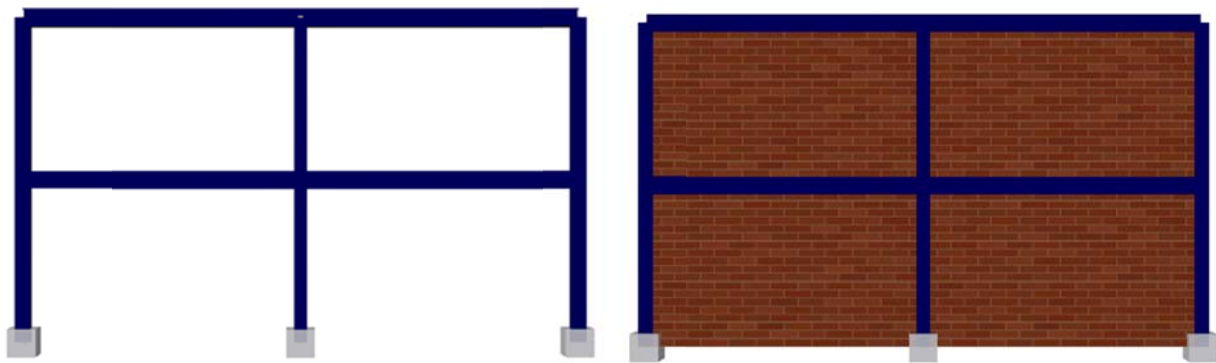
Finite element model: a) Bare multistorey steel frame, b) Multistorey steel frame with infill panels
